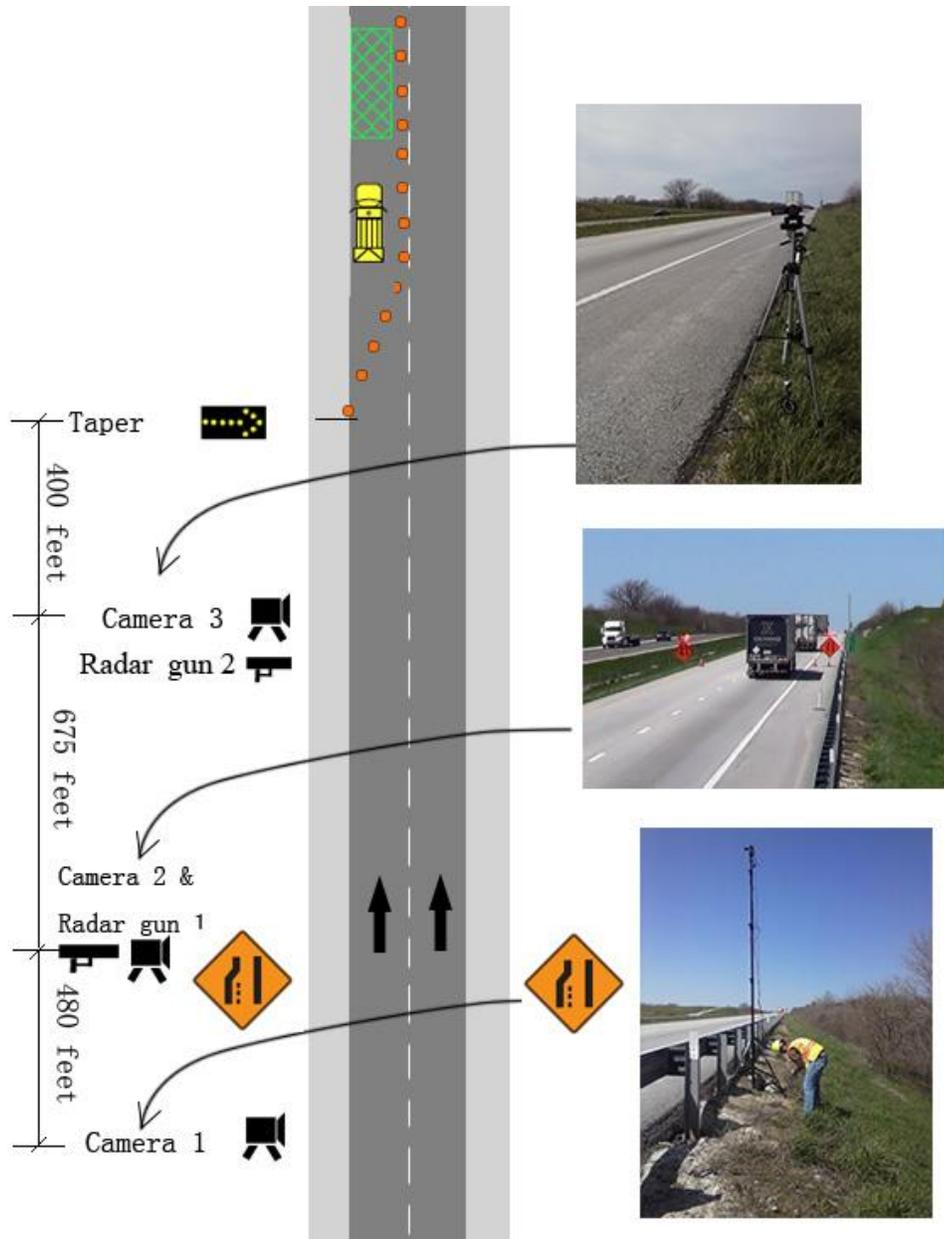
MUTCD plan for a stationary lane closure on a divided highway
